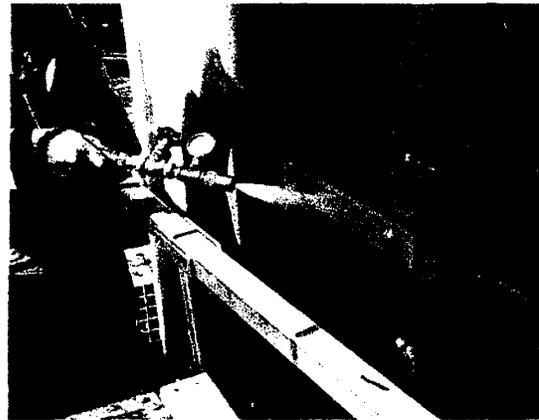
Test #7. Spray directed at horizontal beauty cap/vertical mullion joint.
